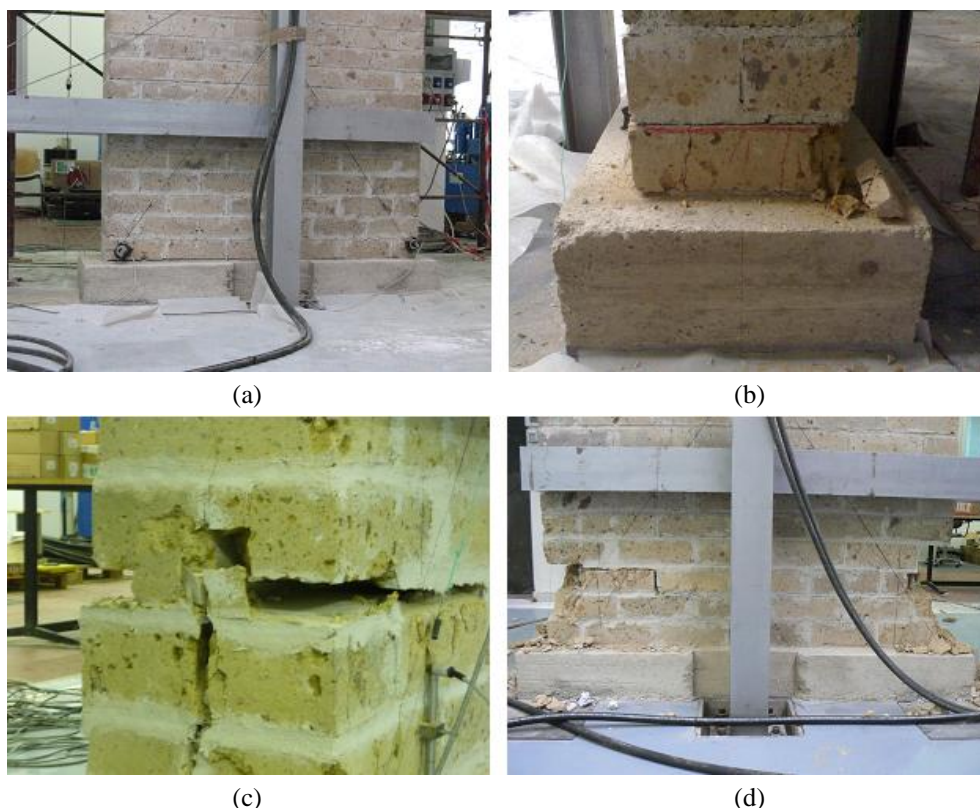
Damage to the pier panels: (a) as-built wall; (b) pre-damaged wall; (c,d) repaired wall
